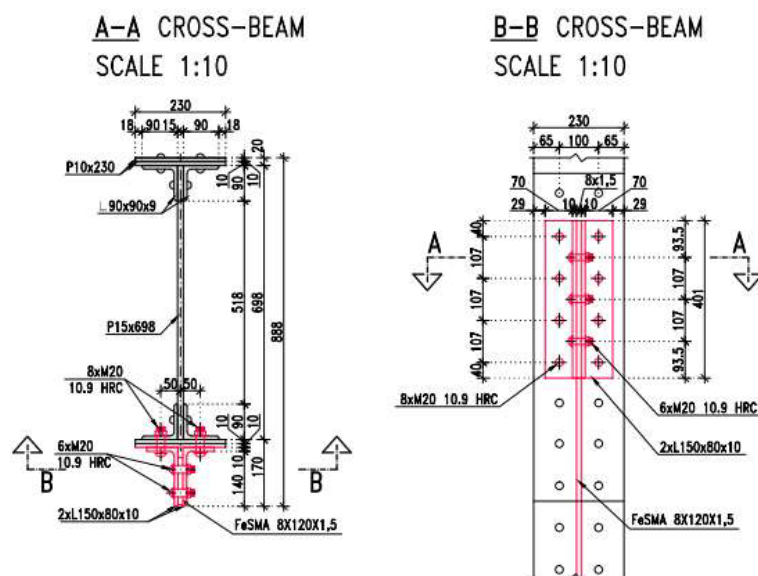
SMA Strengthening Anchorage System (Stančík, 2019).
